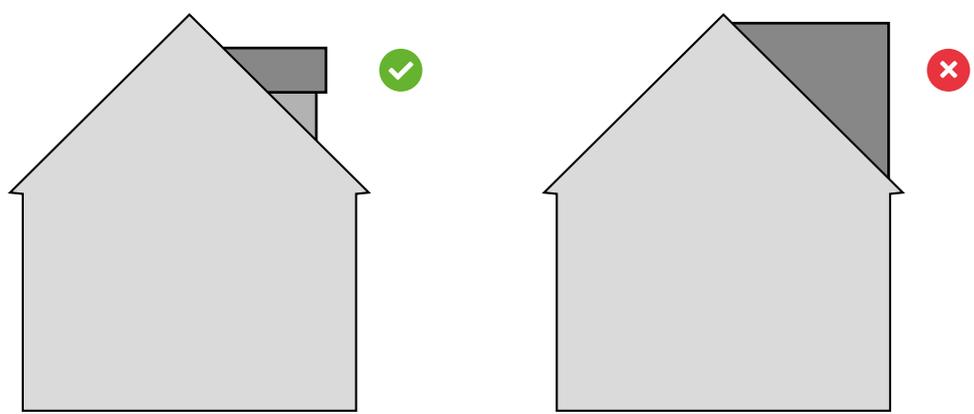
How in section should a dormer appear – set down from the main ridge and back from the eaves.
